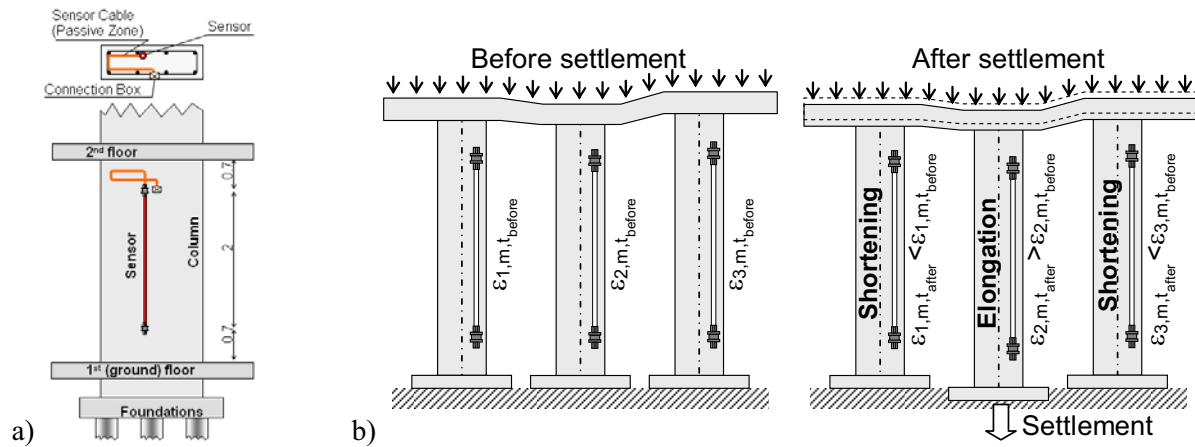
Position of the sensor in the column (a); detection of unequal foundations settlement (b).
